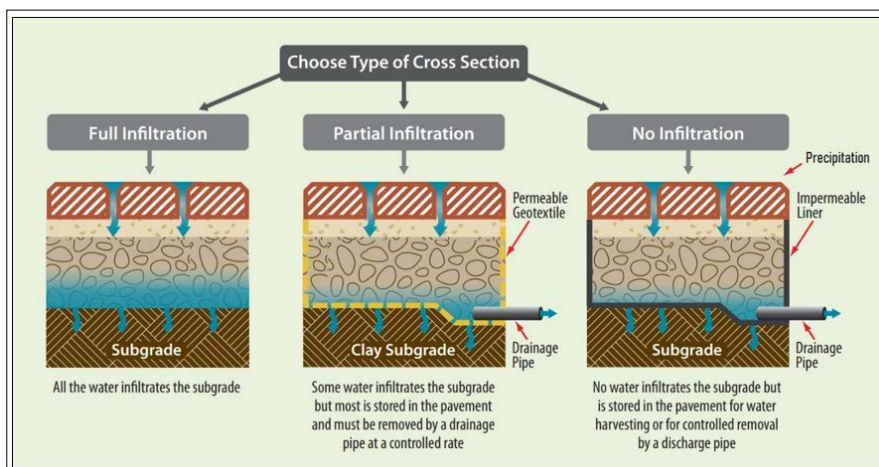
Stormwater flows in the PICP Cross-Section [39]
